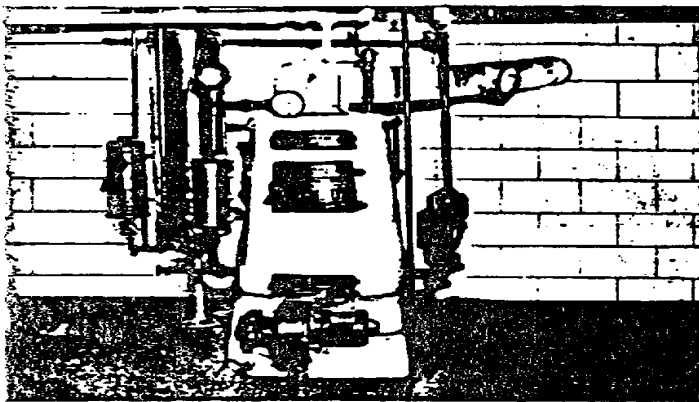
Water Tank and Boiler Domestic Fuel Oil Burner Insulated With INSULAG.
